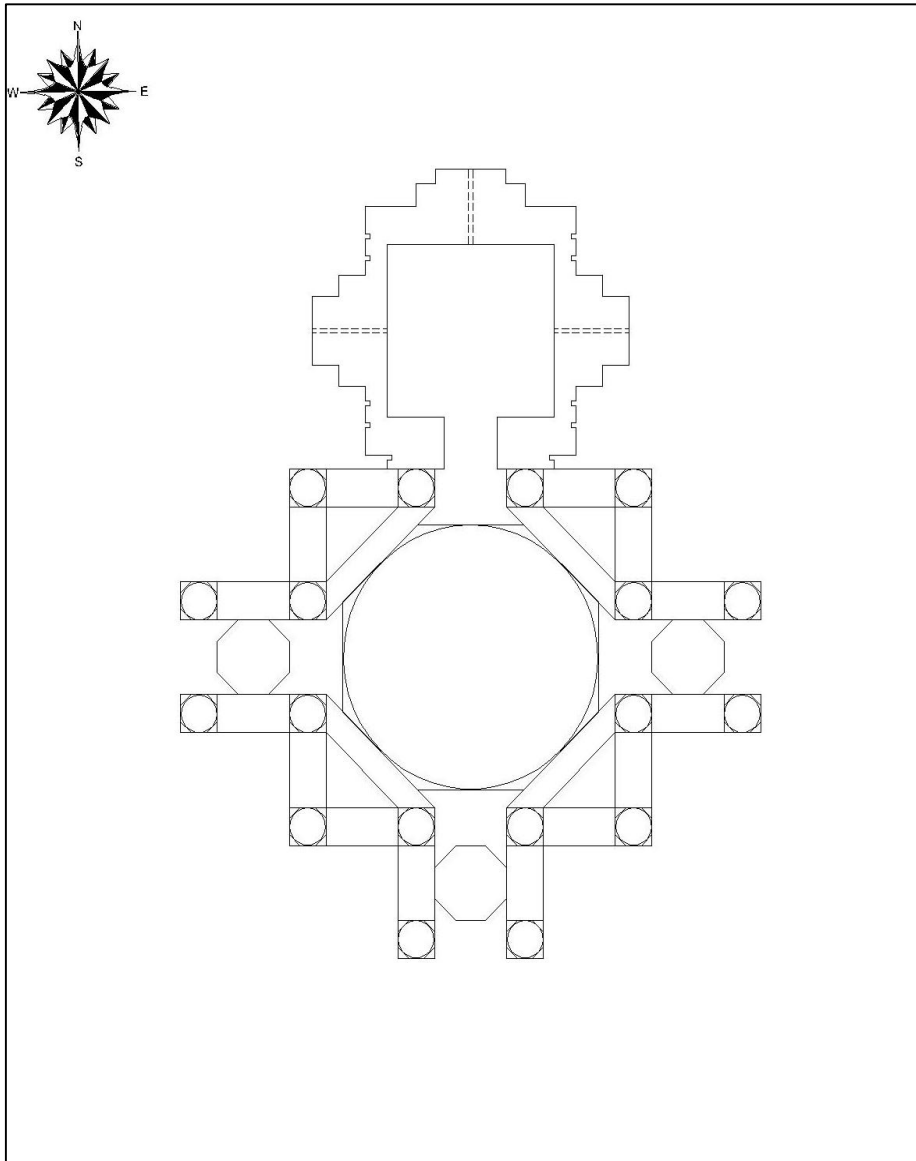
Plan of Shawala Teja Singh Temple (Layout plan by researcher)
